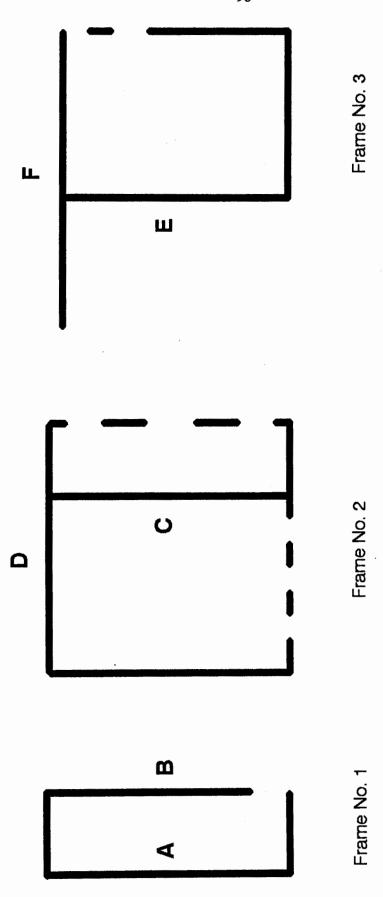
Frame Plans and Selected Wall Arrangement
